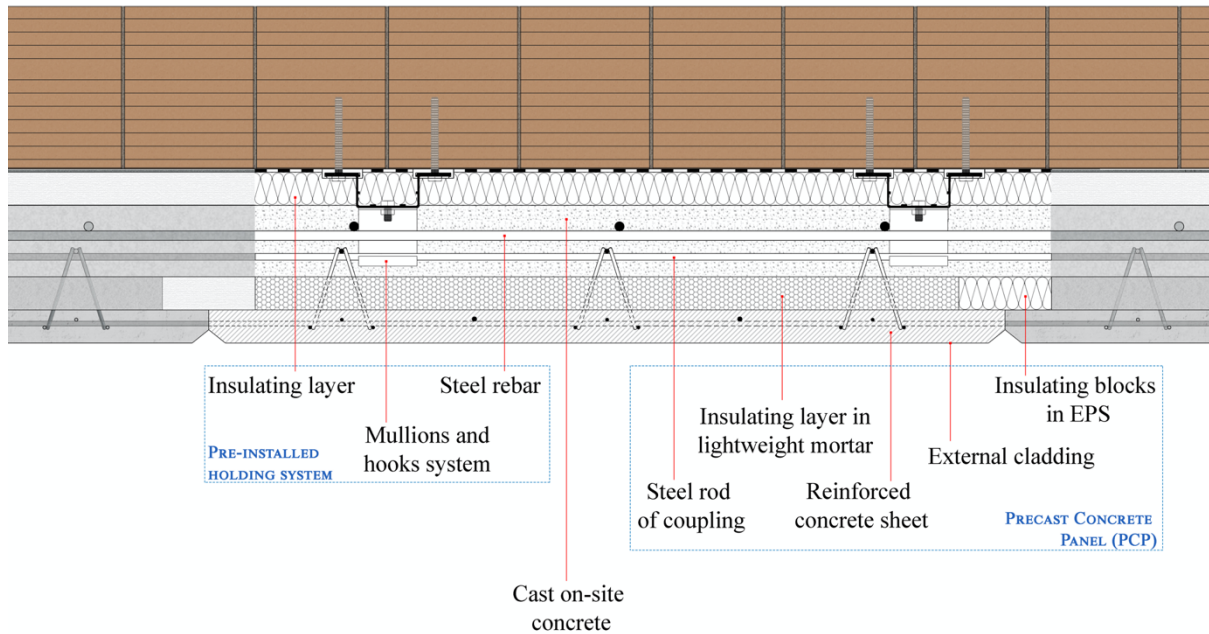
Constructive detail of the innovative precast concrete panel system.
